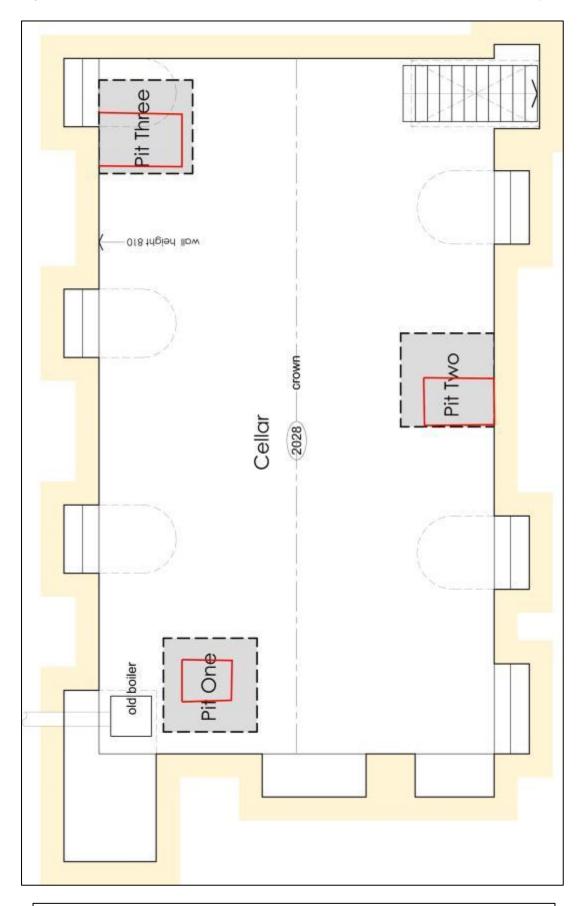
1 Whitefriars, Rye: Test Pit Location Plan Actual Test Pit locations shown in red (Adapted from plan provided by Manning Duffie Architects Ltd)
